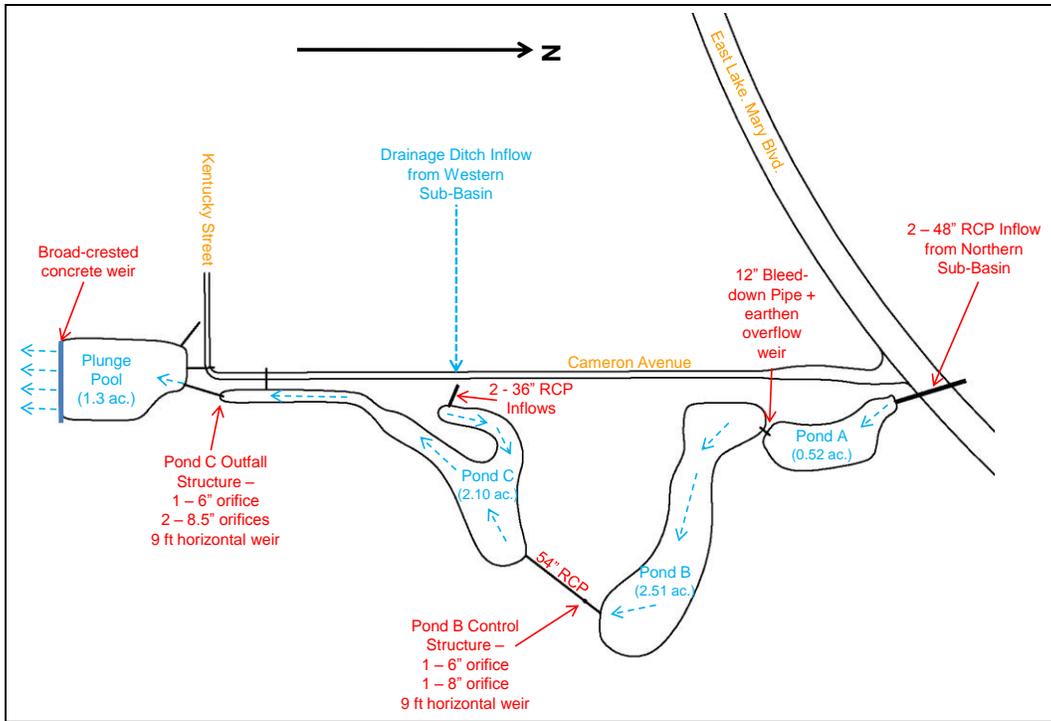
Schematic Overview of the Cameron Ditch Stormwater Facility.
